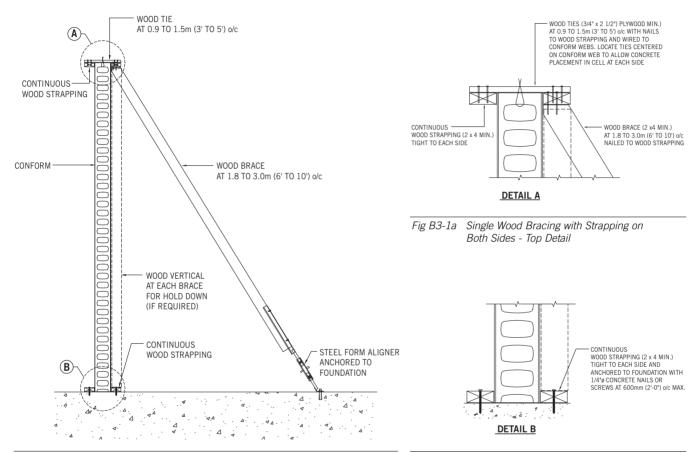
Single Wood Bracing with Strapping on Both Sides
